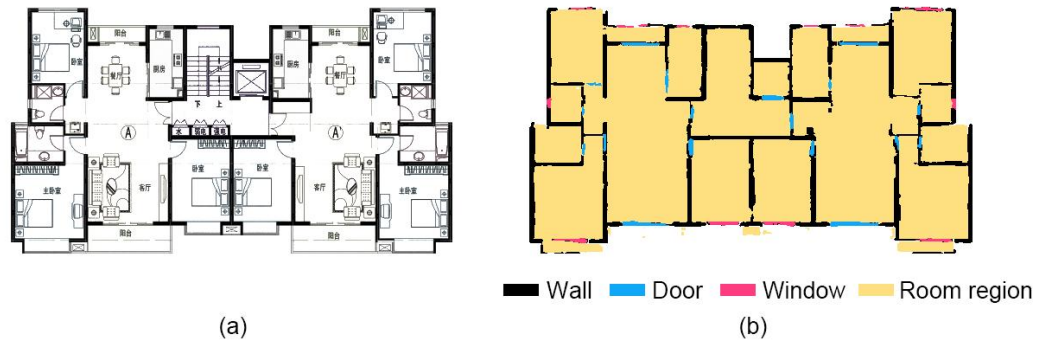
Floor plan segmentation using the modified DMTN model (a) the input sample floor plan (b) four architectural element segmentation results
